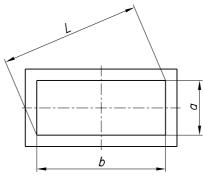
Plan dimensions of spherical and cylindrical bearings
